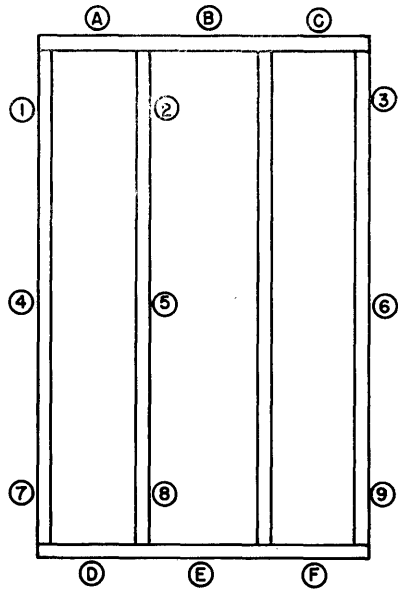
Location Chart for Sampling of Wall Framing as Viewed from Outside
